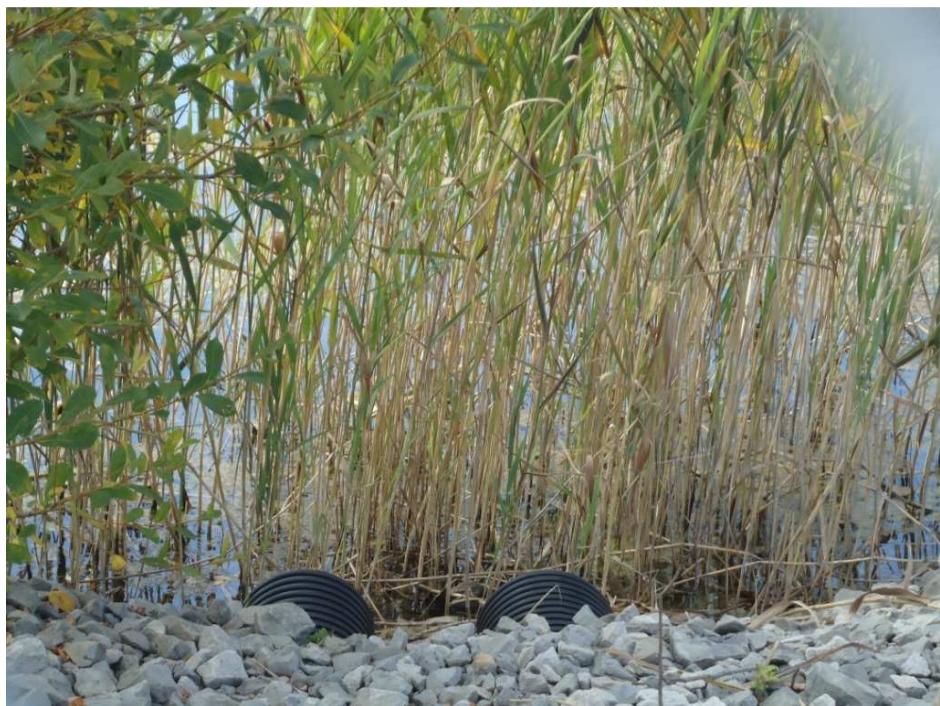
Retention pond looking southwest across outlet pipes in northeast corner.
